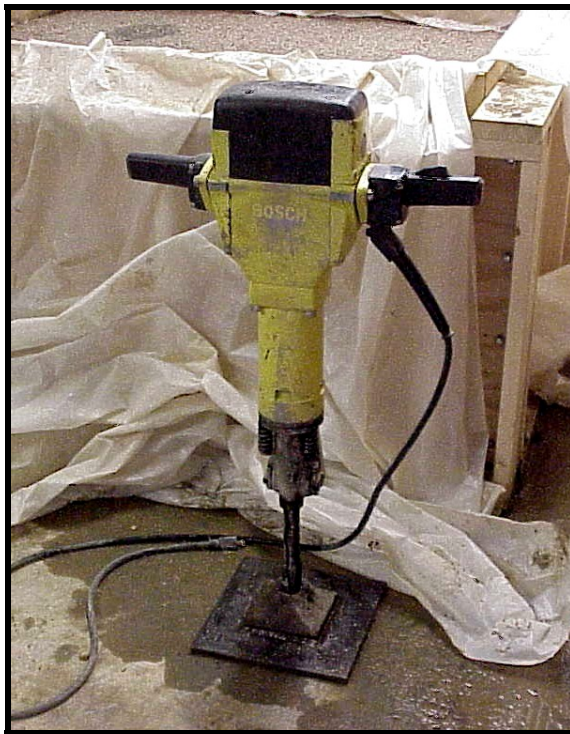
Bosch 11304 hammer with modified flat plate attachment.
